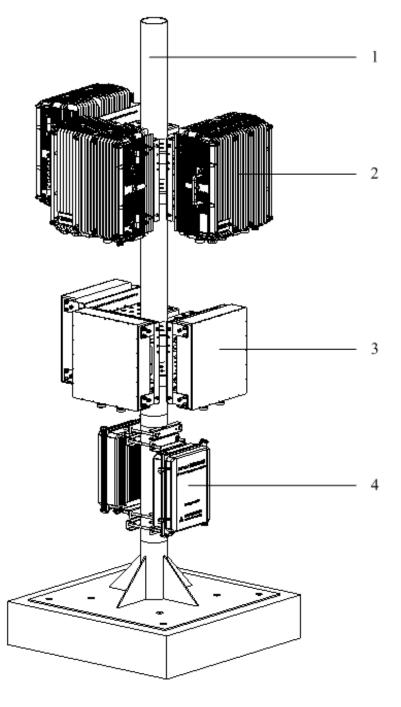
OUTDOOR DC LIGHTNING POLE INSTALLATION
